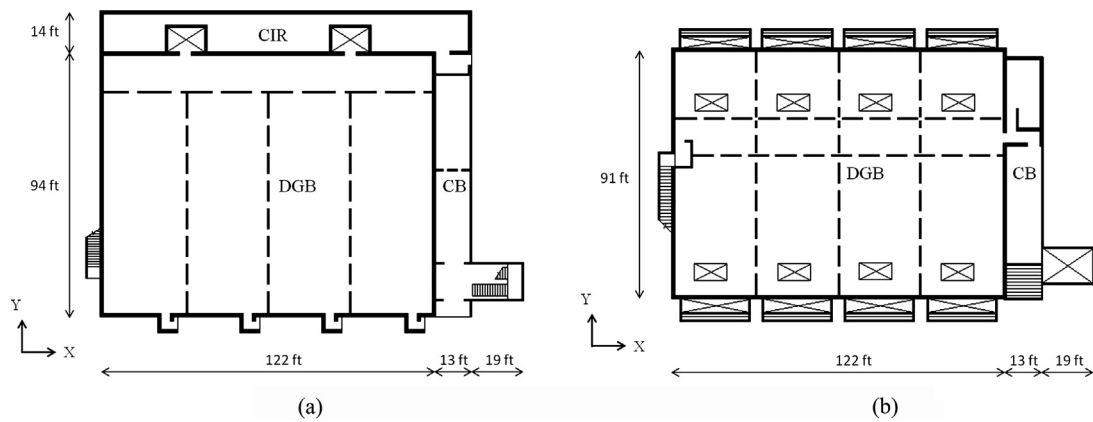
Plan view of DGB complex: (a) top of foundation, El. 742 ft (b) second floor, El. 760 ft.
